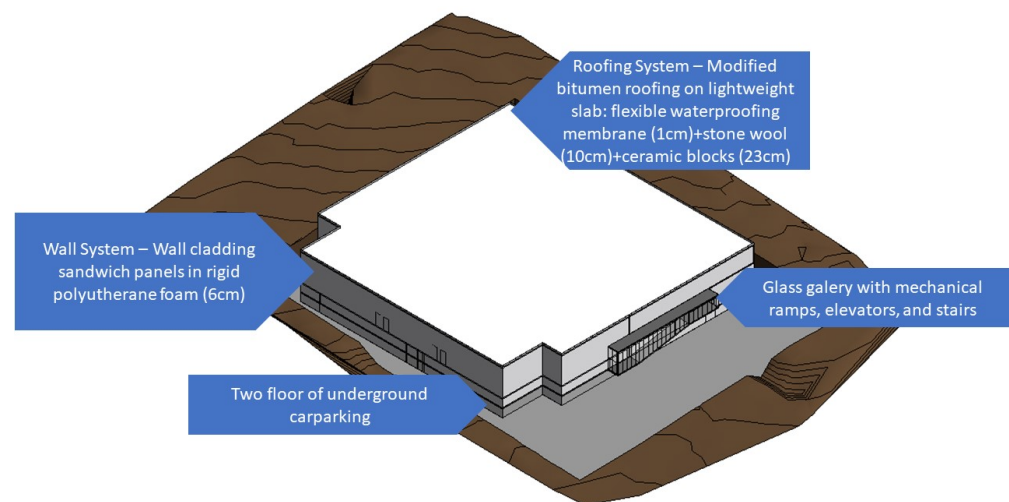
Case study's building modelling in software REVIT® with shell building material specifications.
